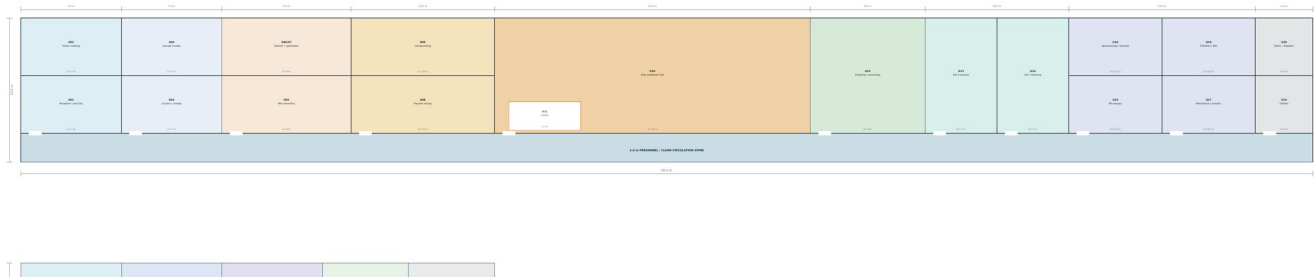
Ground-floor zoning within the 10 m x 90 m building.
